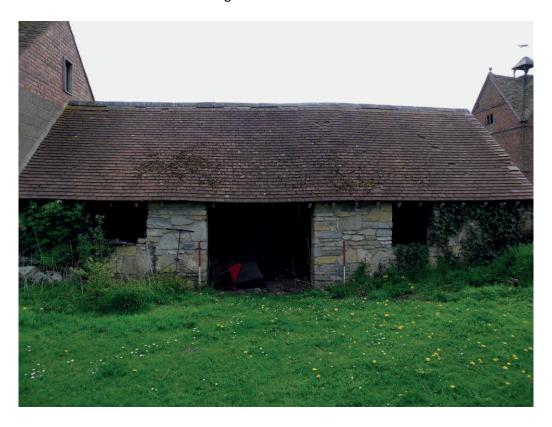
View looking SE showing reconstructed NW facing elevation of Barn C
